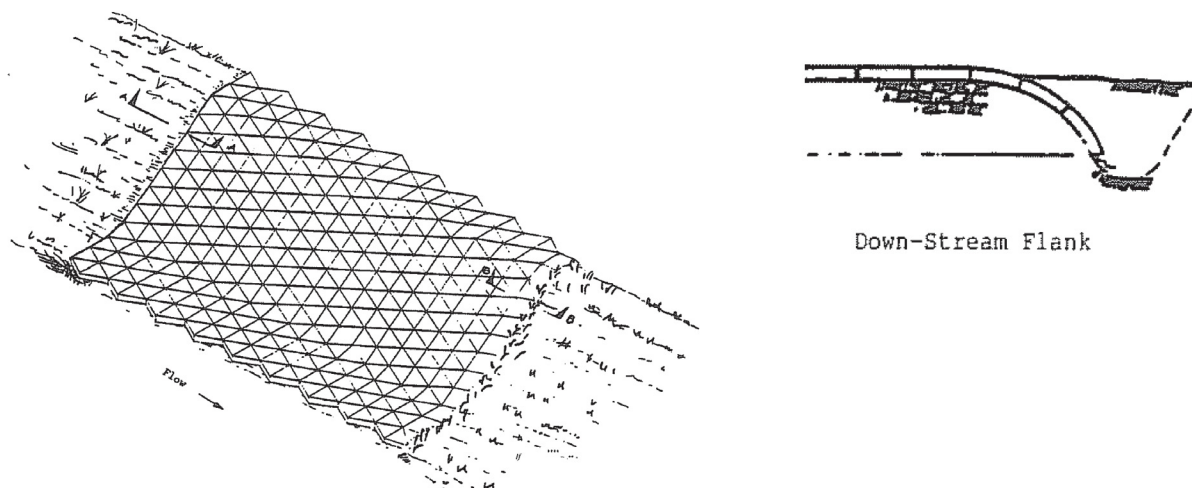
,b Diagram C-5, Section a-a, Schematic View of Flank Details
